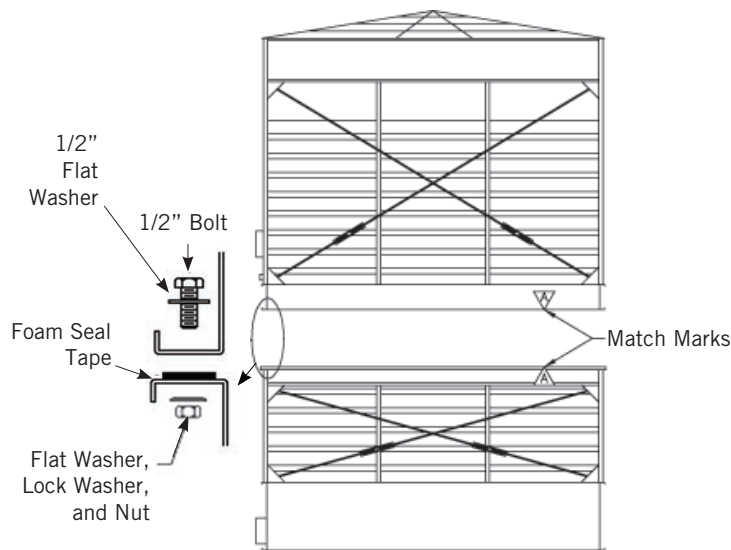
Upper and Lower Assembly for Series 3000 Cooling Towers
